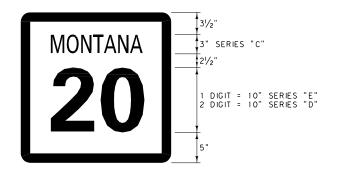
DETAILED DRAWING REFERENCE DWG. NO. 619-24
